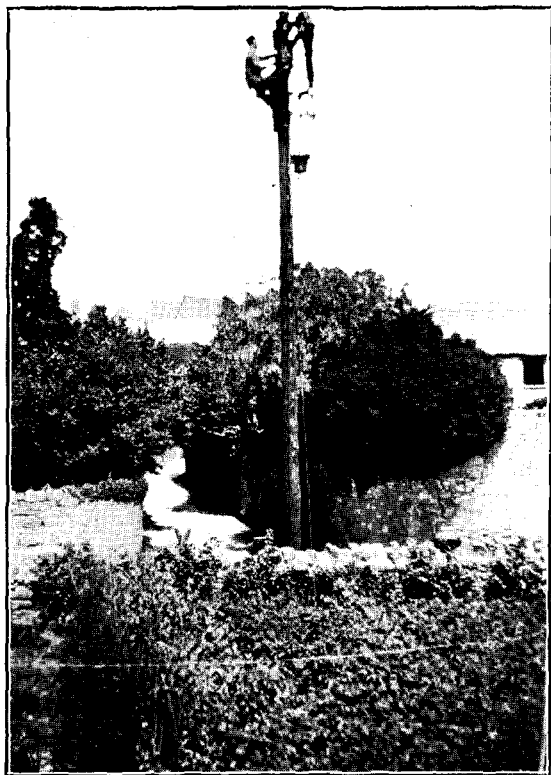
Coil Fitted, and Jointers Testing for Junctions to be Loaded.
